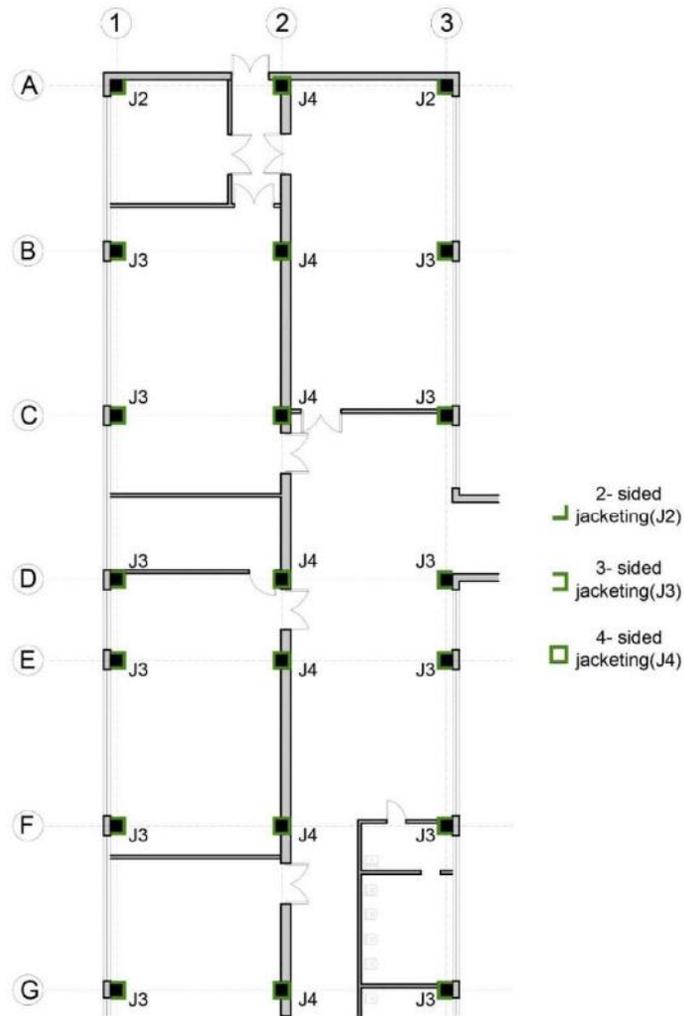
Floor plan of the retrofitted building for RS1: RC jacketing of columns.
